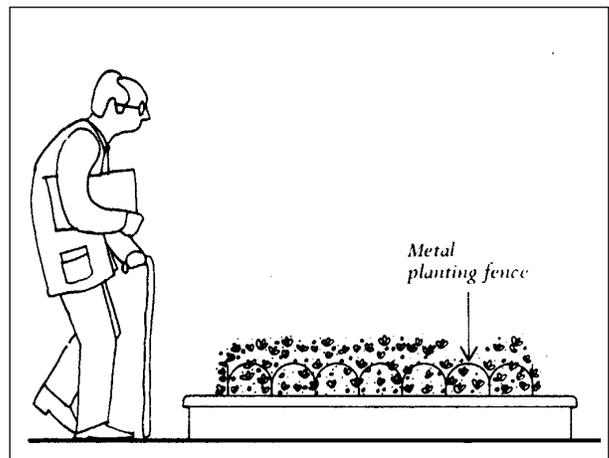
Fixed Planters – Side Elevation of Raised Planting Area Less Than One Foot in Height
